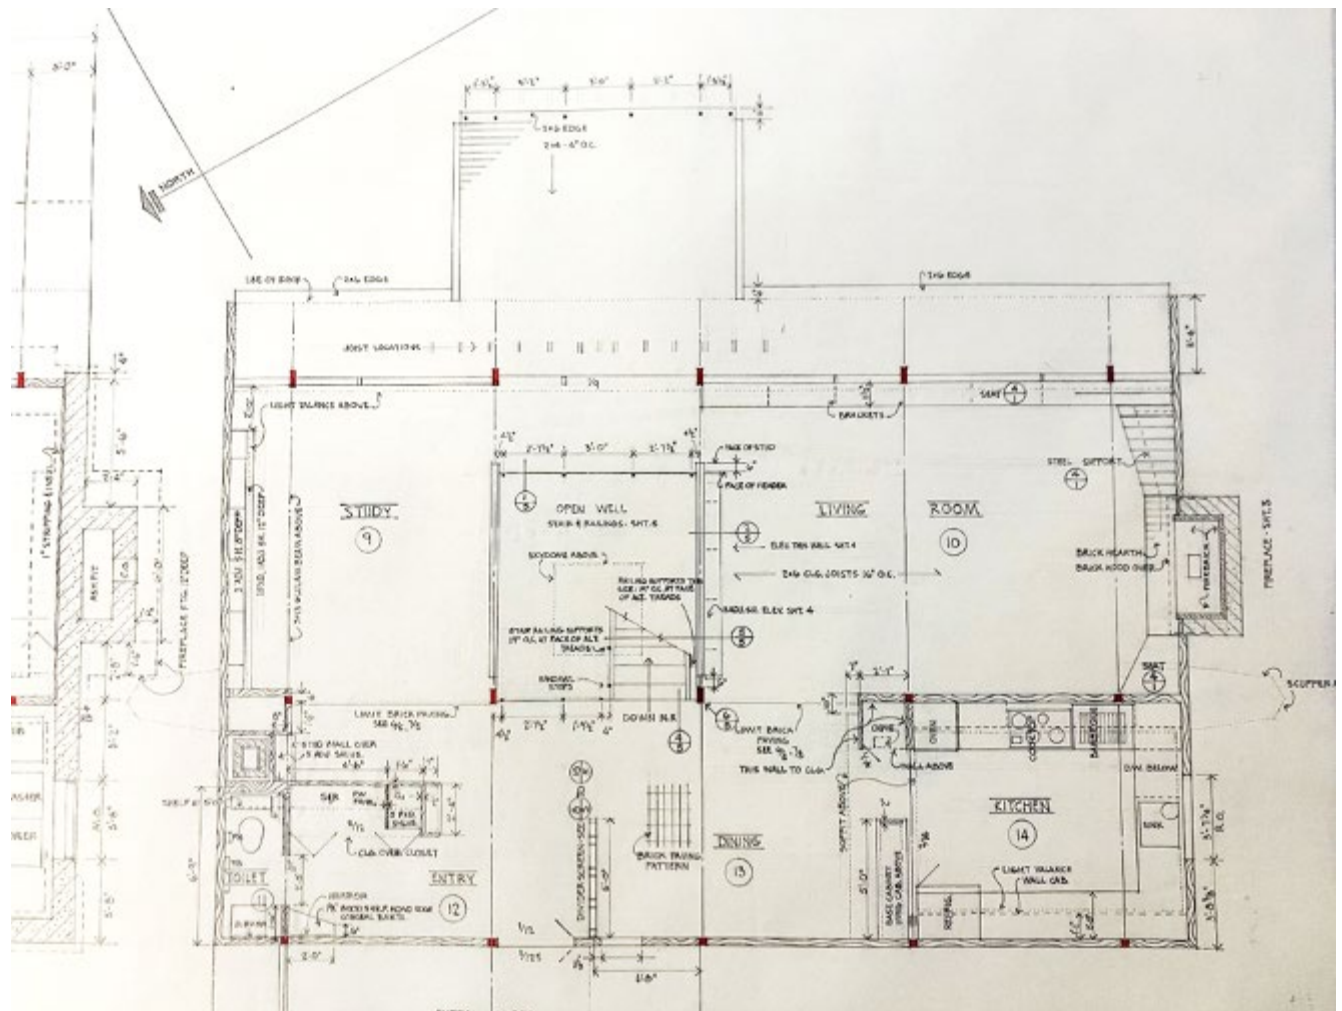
Working drawing, main level floor plan. Close Associates Papers
